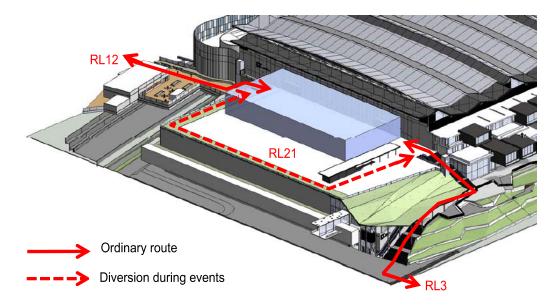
Proposed Quarry Street link over Event Deck Source: Proponent SSD Application
